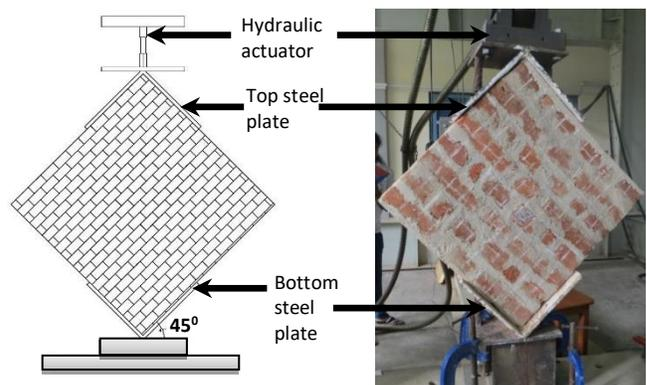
The test setup; (a) Schematic diagram and (b) NRUMW at the test setup
